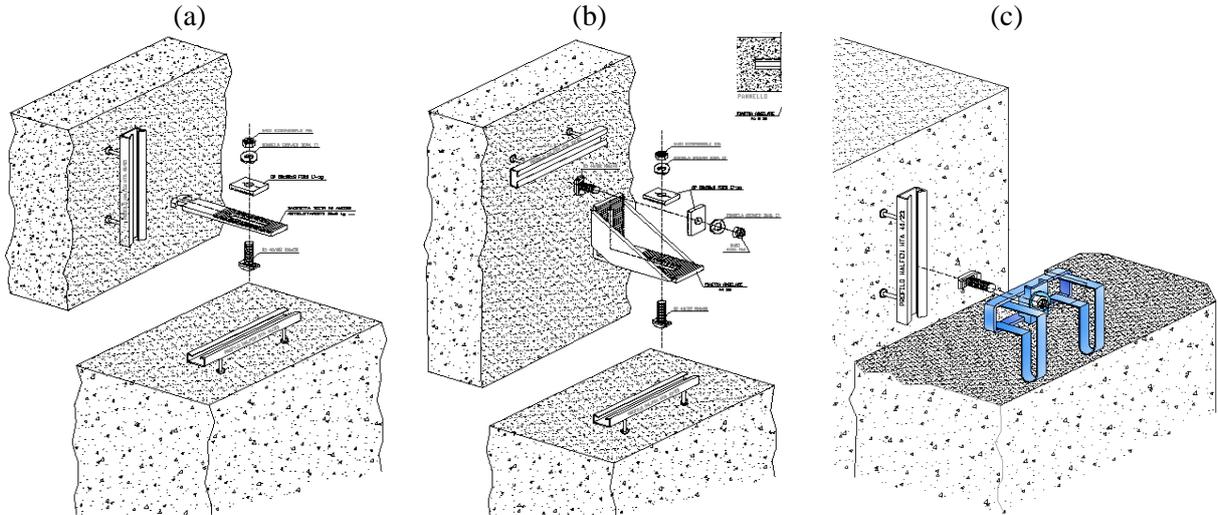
Typical panels' connections: a) sliding connection, b) angle connection, c) cantilever connection
